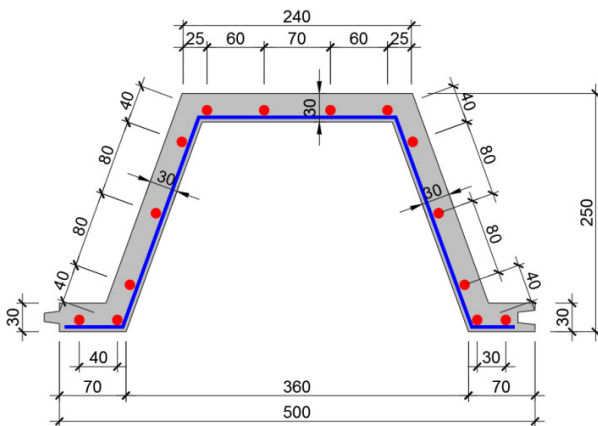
Arrangement 14φ12 type CB400V bars for UHPC sheet piles.
